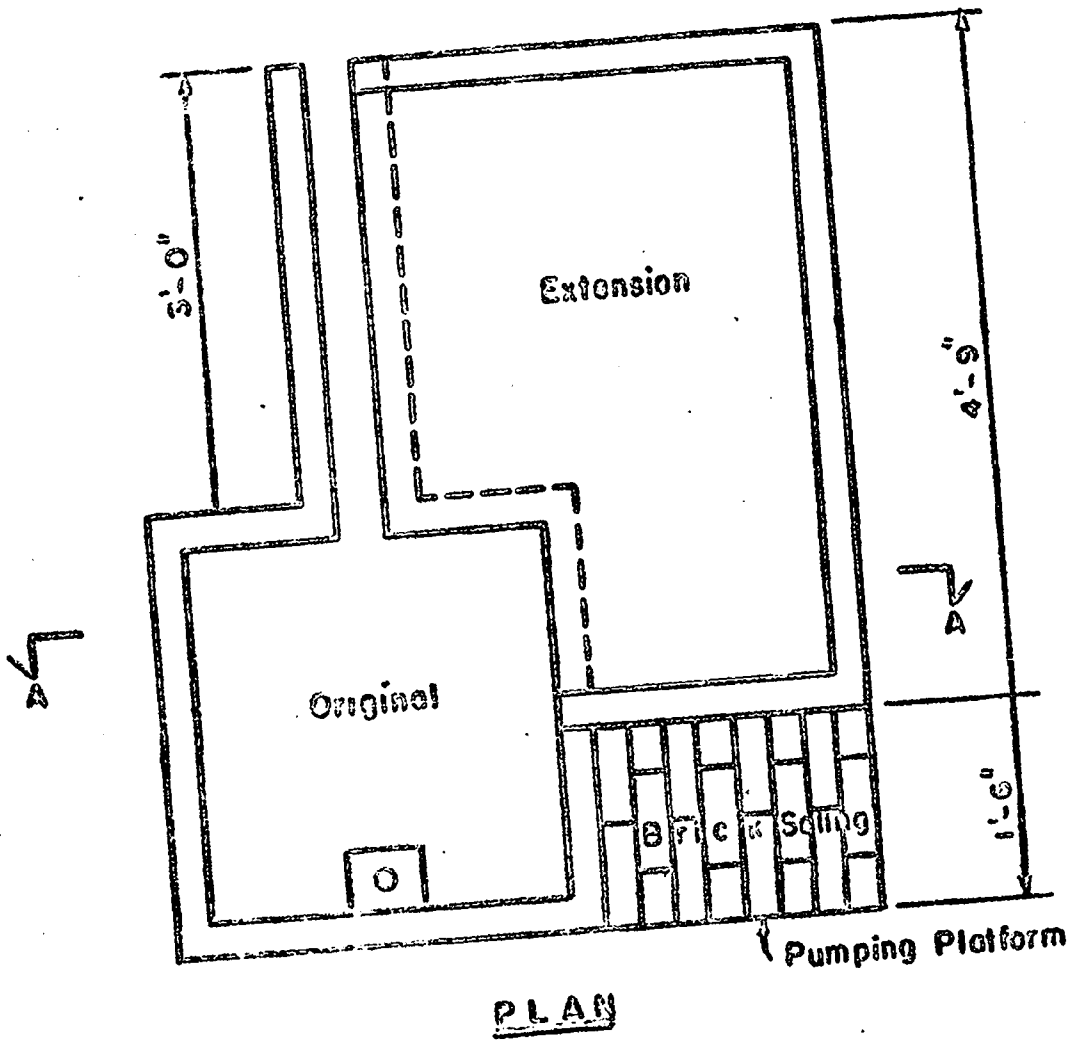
Showing the Detail Drawing of Existing and Extended Platform.
